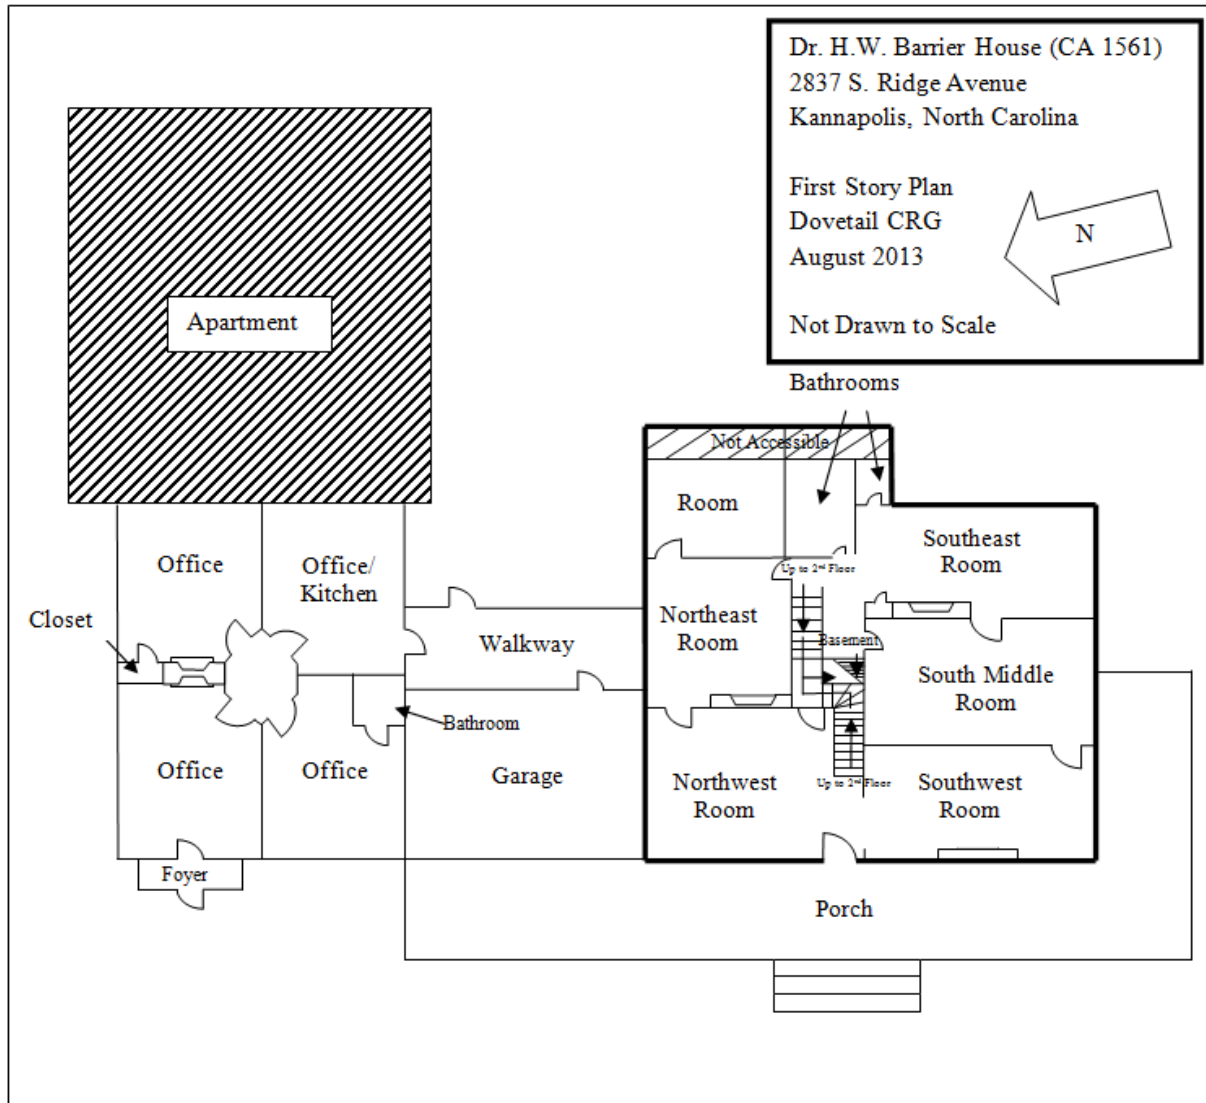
First Story Plan of the Dr. H.W. Barrier House.
